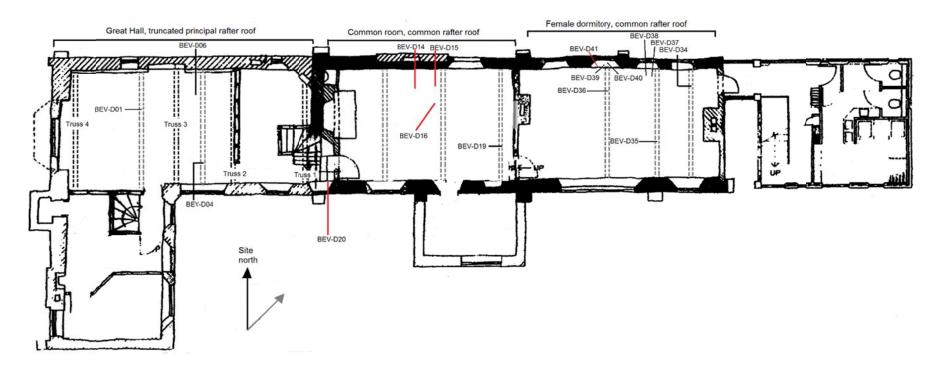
First-floor plan, showing the location of samples BEV-D01, BEV-D04, BEV-D06, BEV-D14–16, BEV-D19–20, and BEV-D34–41 (after Ingleby & Hobson Architects)
